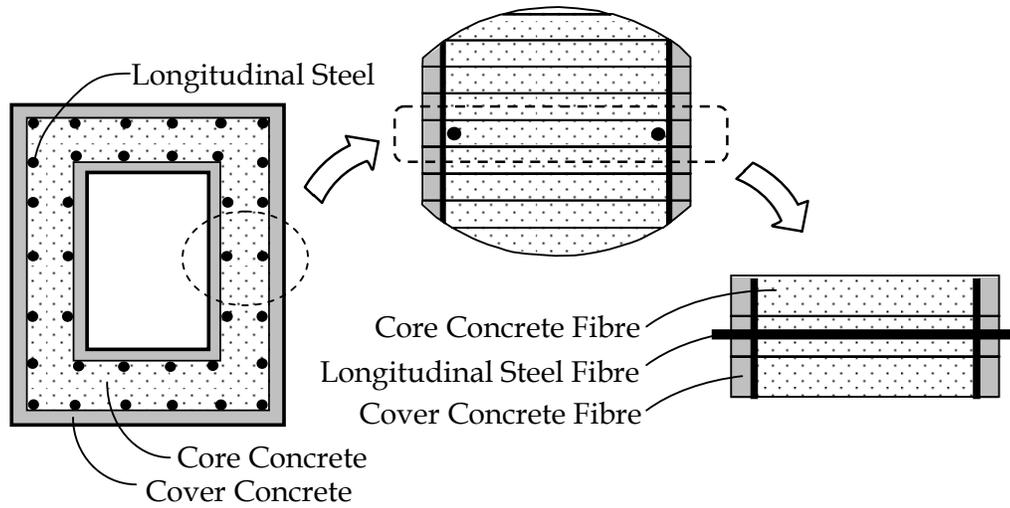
Discretisation of a hollow rectangular RC section into concrete (core and cover) and longitudinal steel fibres.
